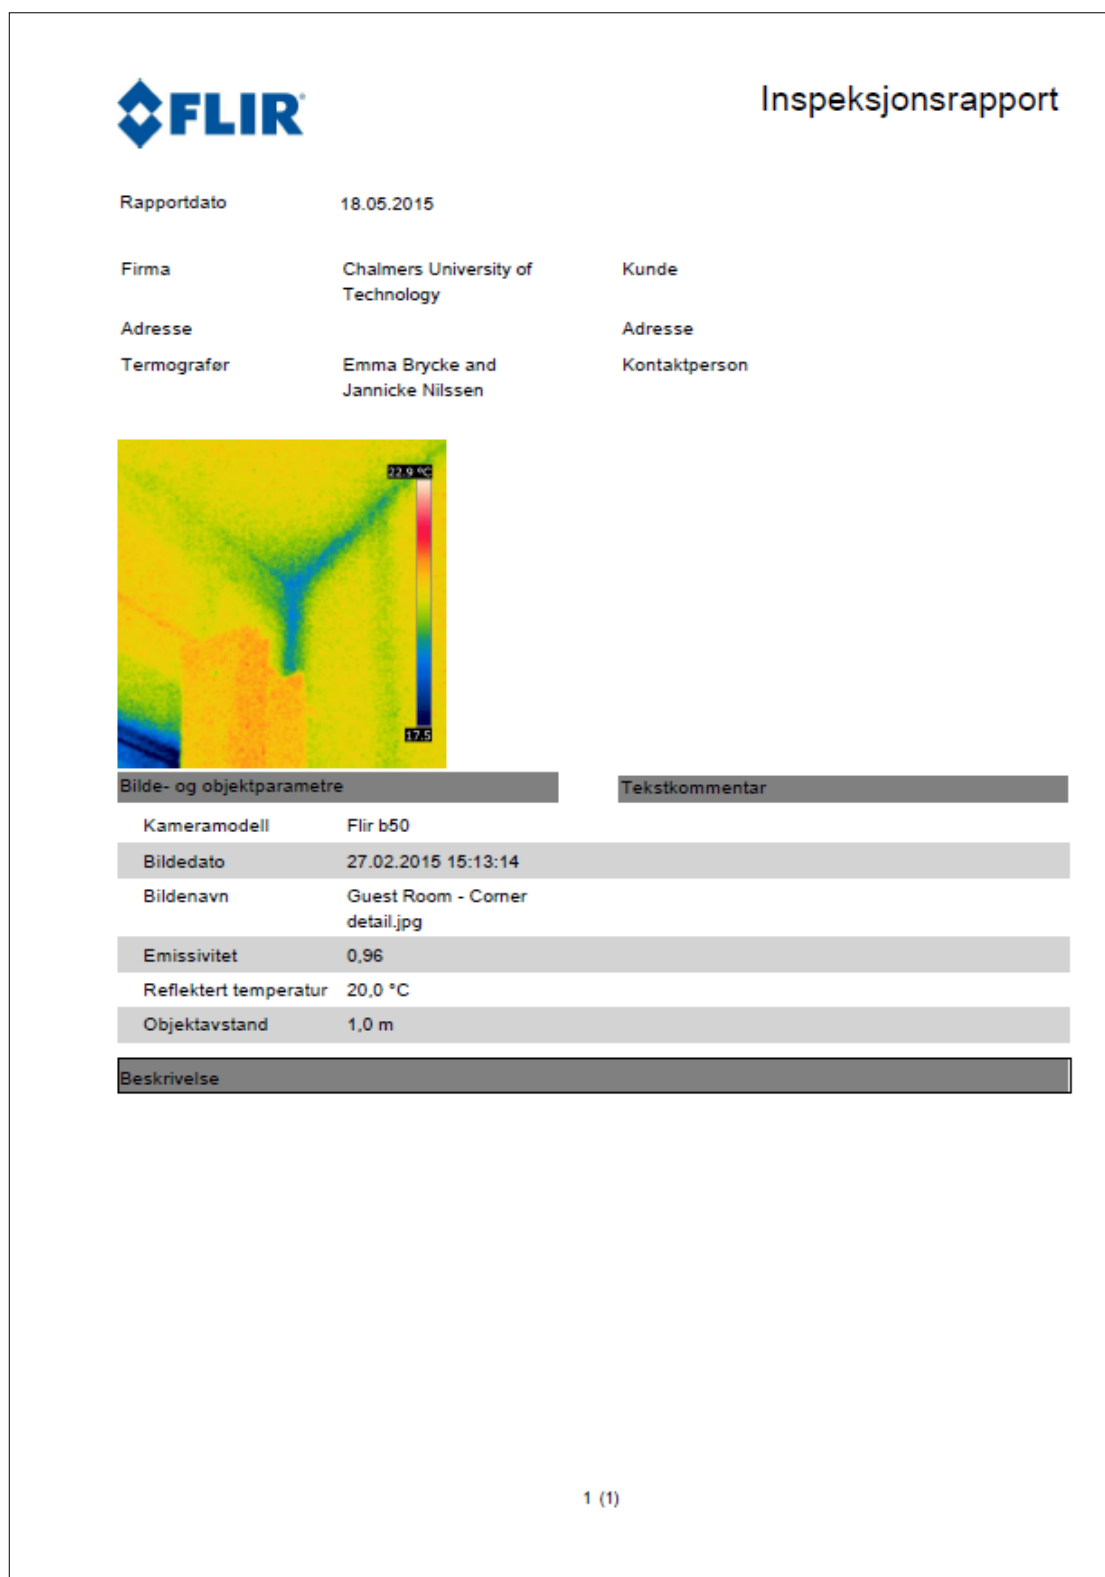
Corner Detail – Roof/Wall nr. 1.
